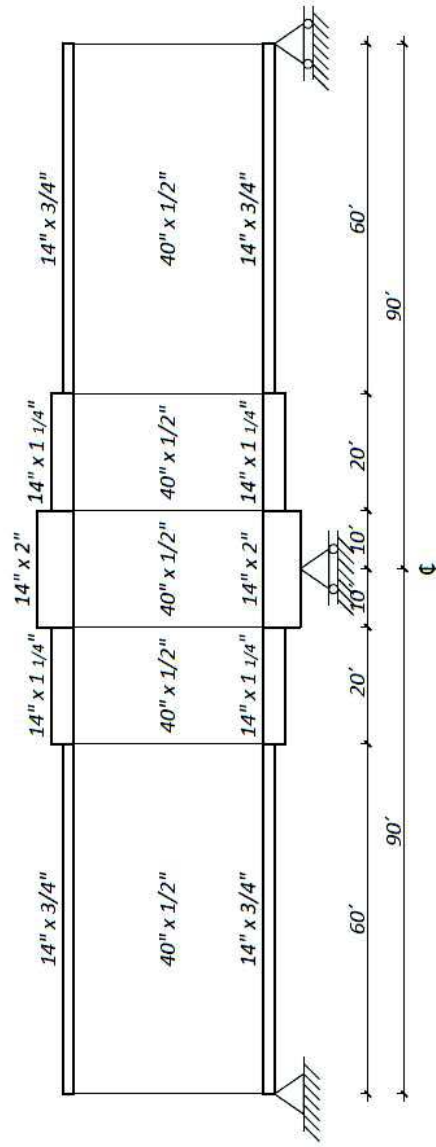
Sketch of the typical 90'-90' two-span composite steel I-girder bridge
